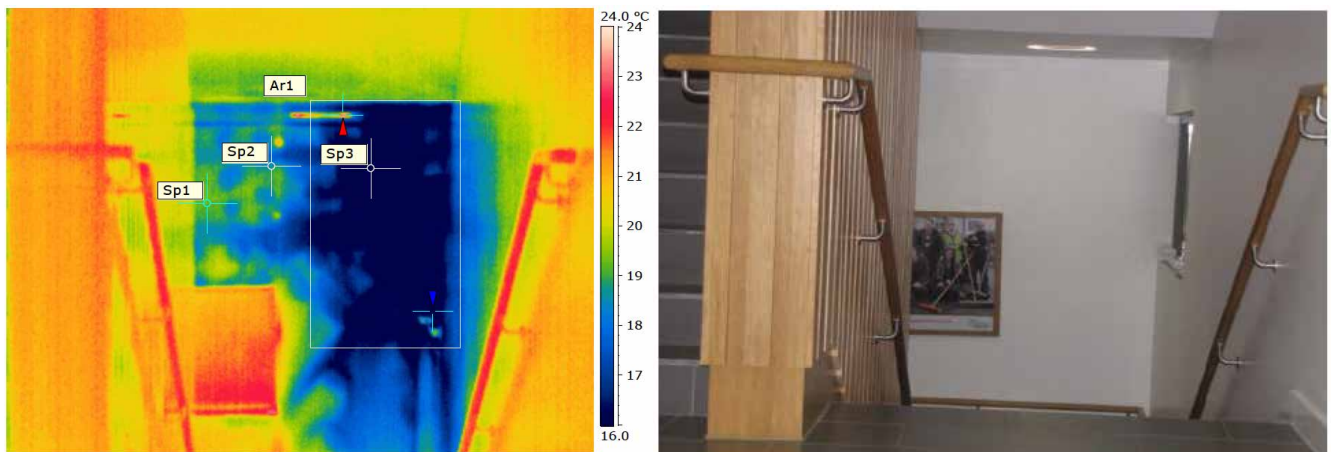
Potential thermal bypass behind plasterboard - main stair core
